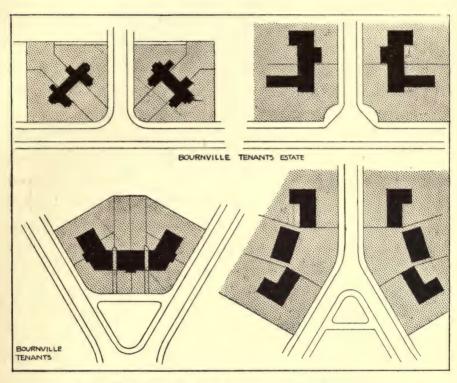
SUGGESTIONS FOR GROUPING CORNER BUILDINGS
